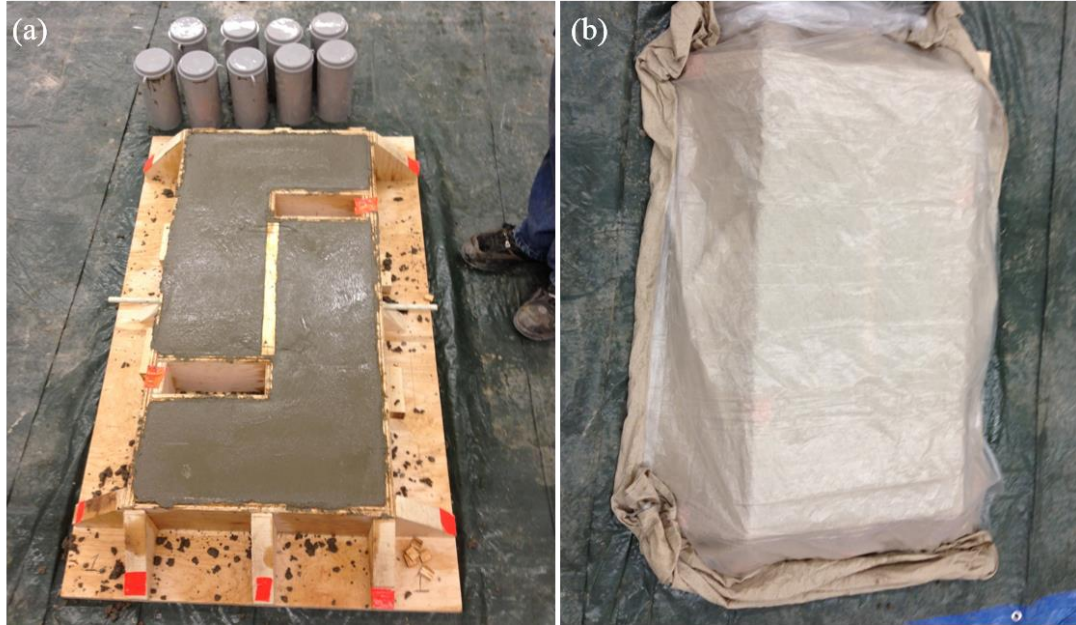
Concrete Casting: (a) Test Specimen and Cylinders; (b) Field Curing
